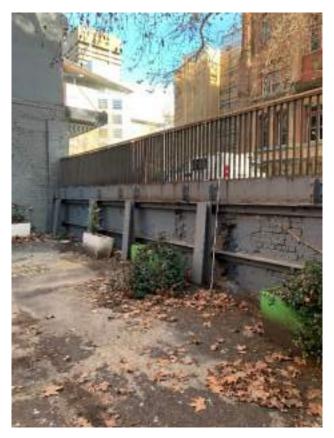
View south of retaining wall at Harris Street end of 634-642 Harris Street
